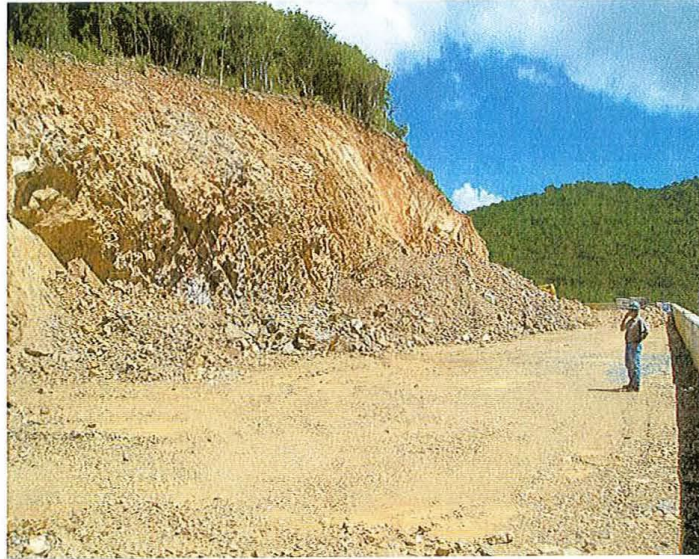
Identifiable Rock Slabs in the Excavation Face South of the Collapsed Area, Looking Toward Northwest.
